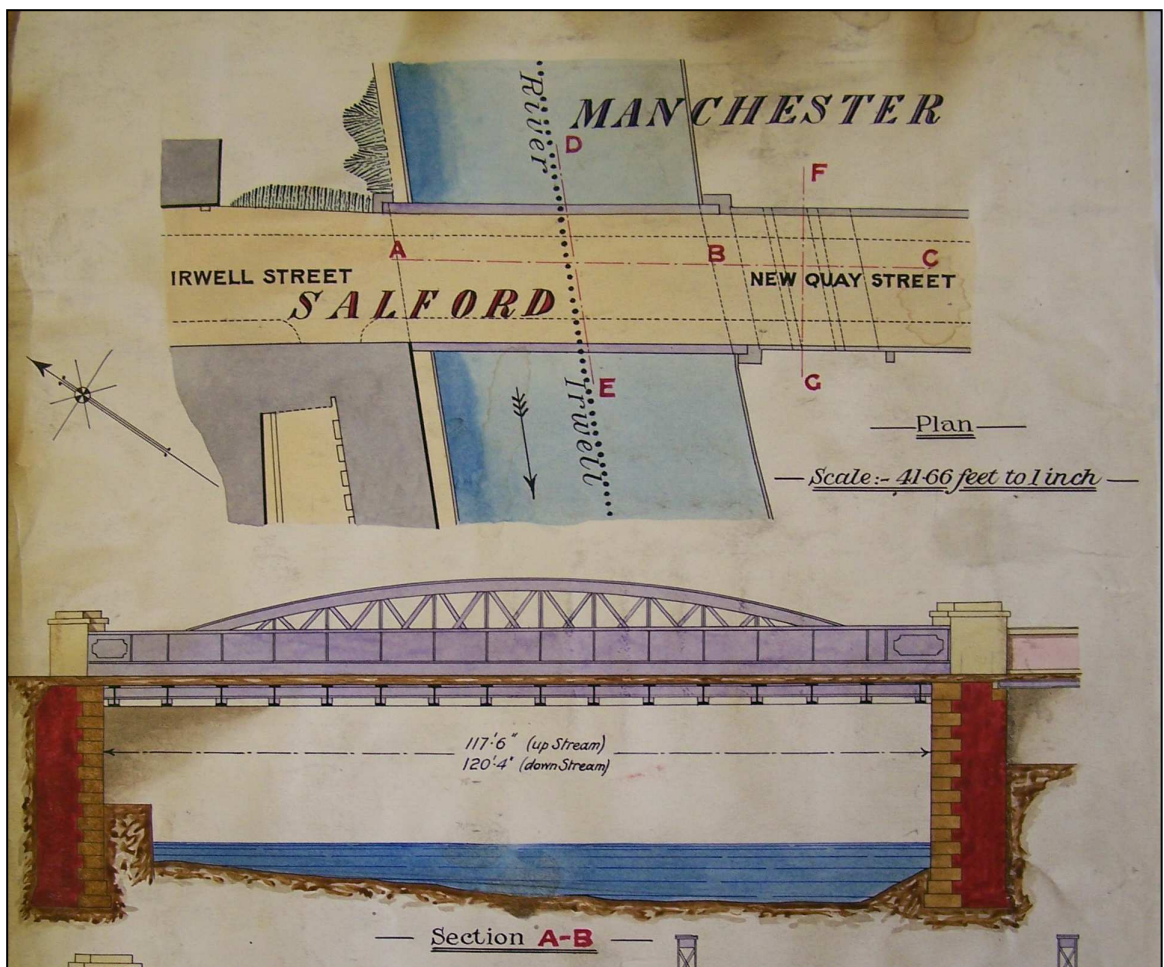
Irwell Street Bridge general details (drawing from Manchester Corporation old record book, dated 1907) (Manchester Corporation 1907).
